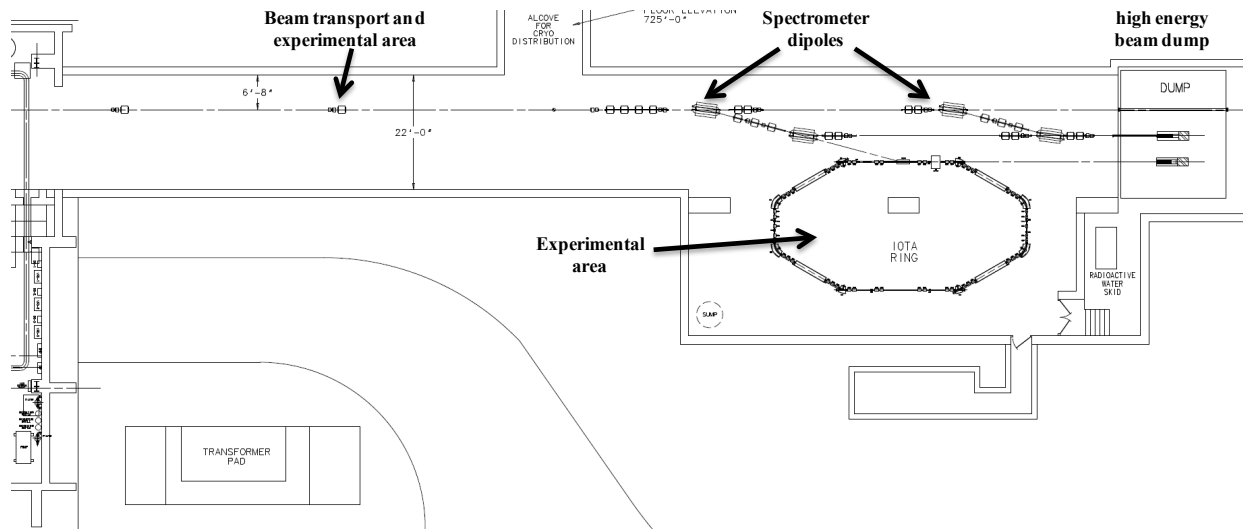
Downstream plan view of the ASTA high energy beamlines and experimental areas in the new underground tunnel. The tunnel extension is 70 m long. A service building is located above the experimental area.
